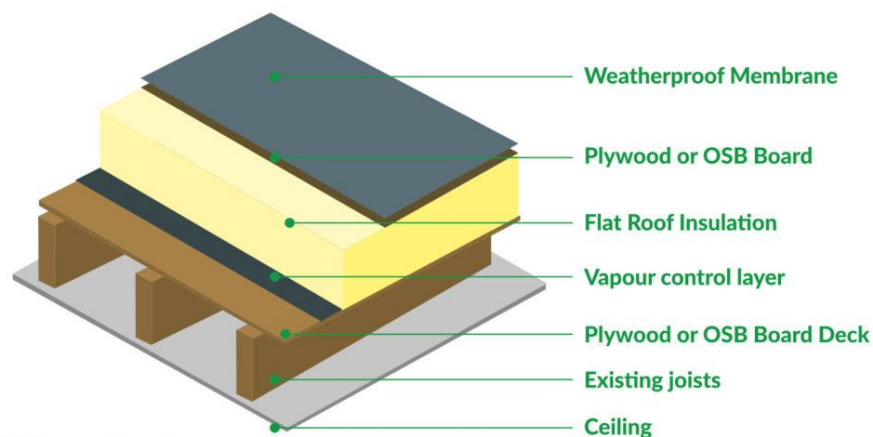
Composition of an insulated roof (Flat Roof Insulation, n.d.)
